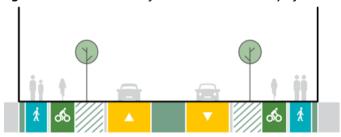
CFAF Outcome - Upgrade to Wainui Road indicative 24 m cross section
